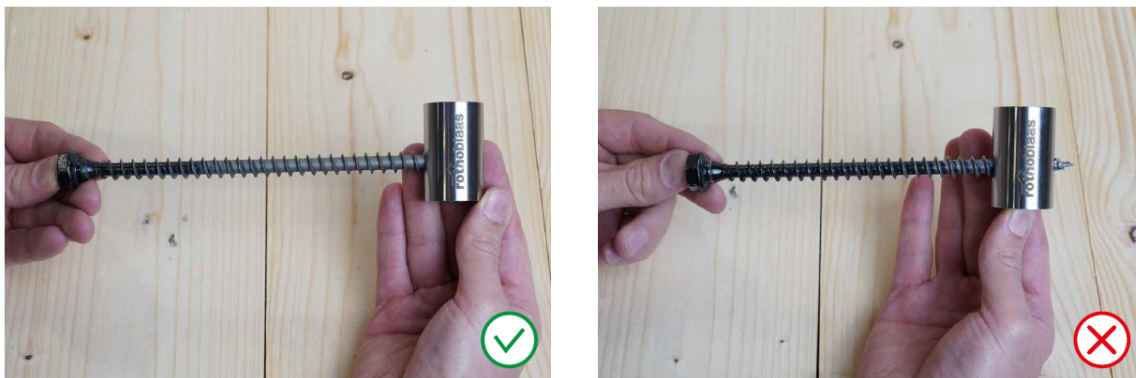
Real examples of visual inspections of used screws with gauge JIG REUSE. Thread wear check passed (left). Thread wear check NOT passed, screw to be discarded (right).
